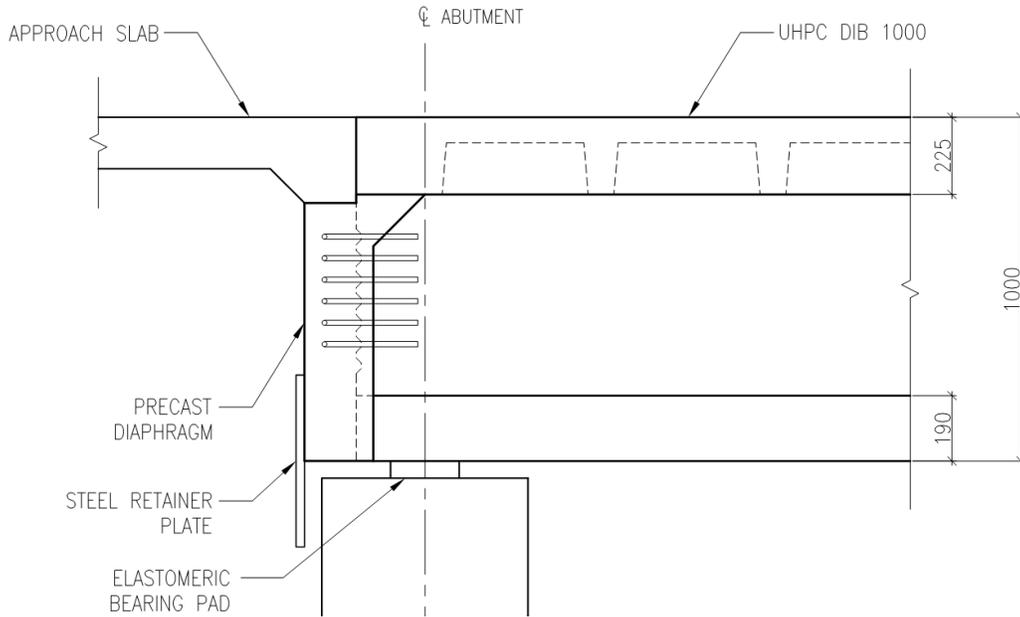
Abutment Detail (Typical reinforcement not shown for clarity)
